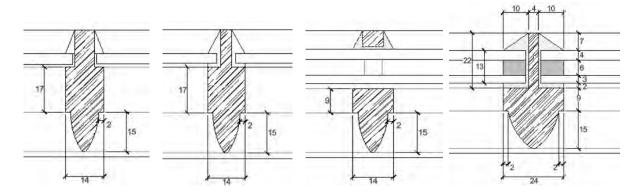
L-R: Existing astragal detail (14mm). Proposed replacement window with single glazing and structural astragal detail (14mm). Proposed replacement window with double glazing and non-structural/plant-on astragal detail (14mm). Alternative structural astragal window detail (not proposed) (24mm).
